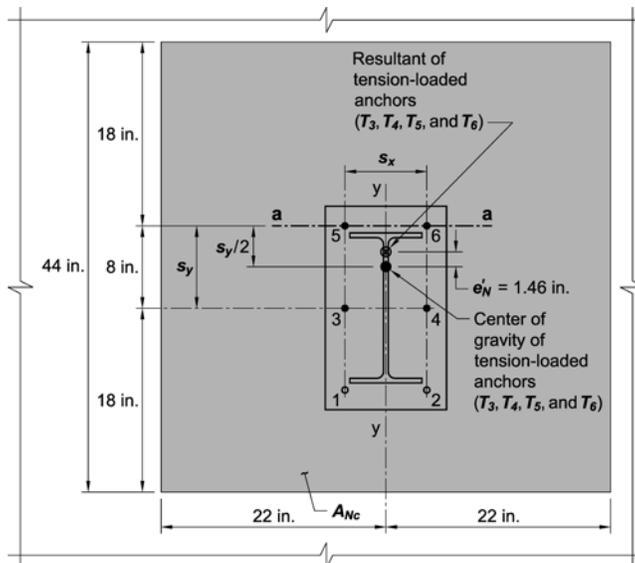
Example 11: Determination of projected failure area and e'_N for tension-loaded anchors.
